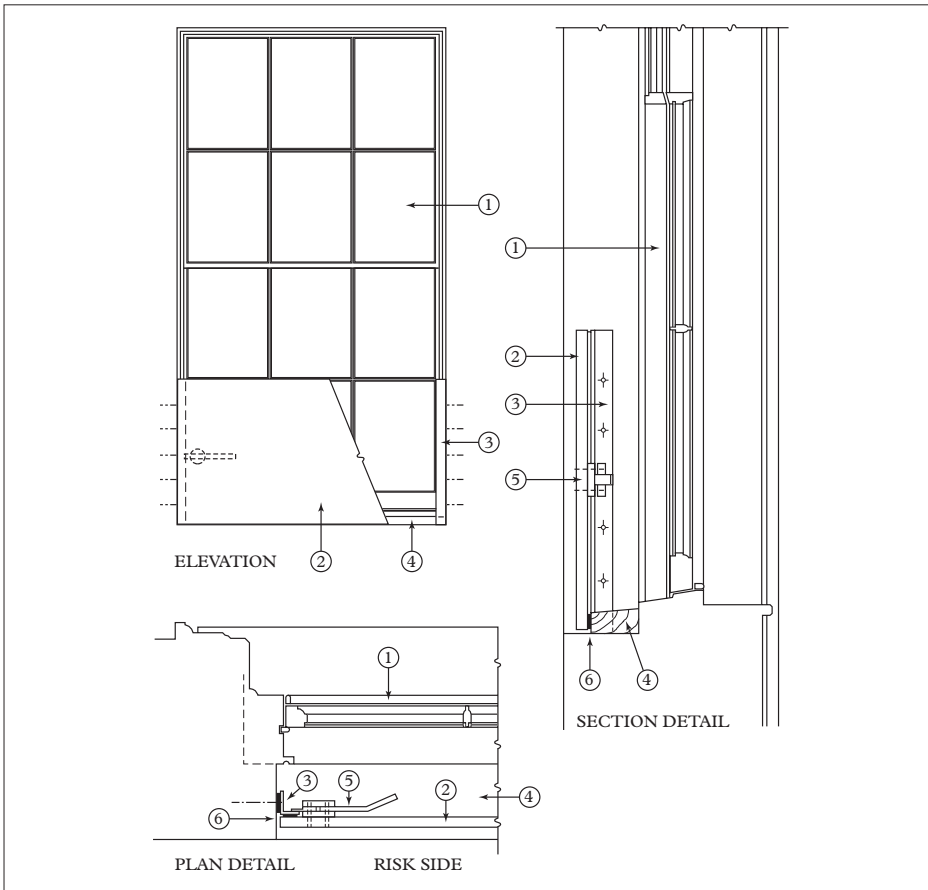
(top) Typical sash window barrier: compression type (1) Sash window: can be additionally protected by the fitting of proprietary draught and weather stripping to the sashes and parting beads (2) Barrier: painted external quality lipped plywood or similar board (3) Painted galvanised metal angles bedded in waterproof mastic and fixed to reveals each side of opening (4) Painted, treated timber packer to provide compression along bottom edge of board (5) Locking mechanism to pull board and seals tight against metal angles and timber packer (6) Self-adhesive compressible foam sealing strips stuck to rear face (bottom and sides) and along bottom edge of board
